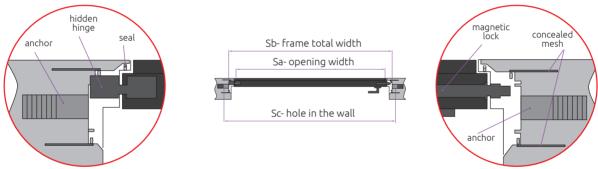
SECTION OF DOOR FRAME OPENING OUTWARDS (type B)
